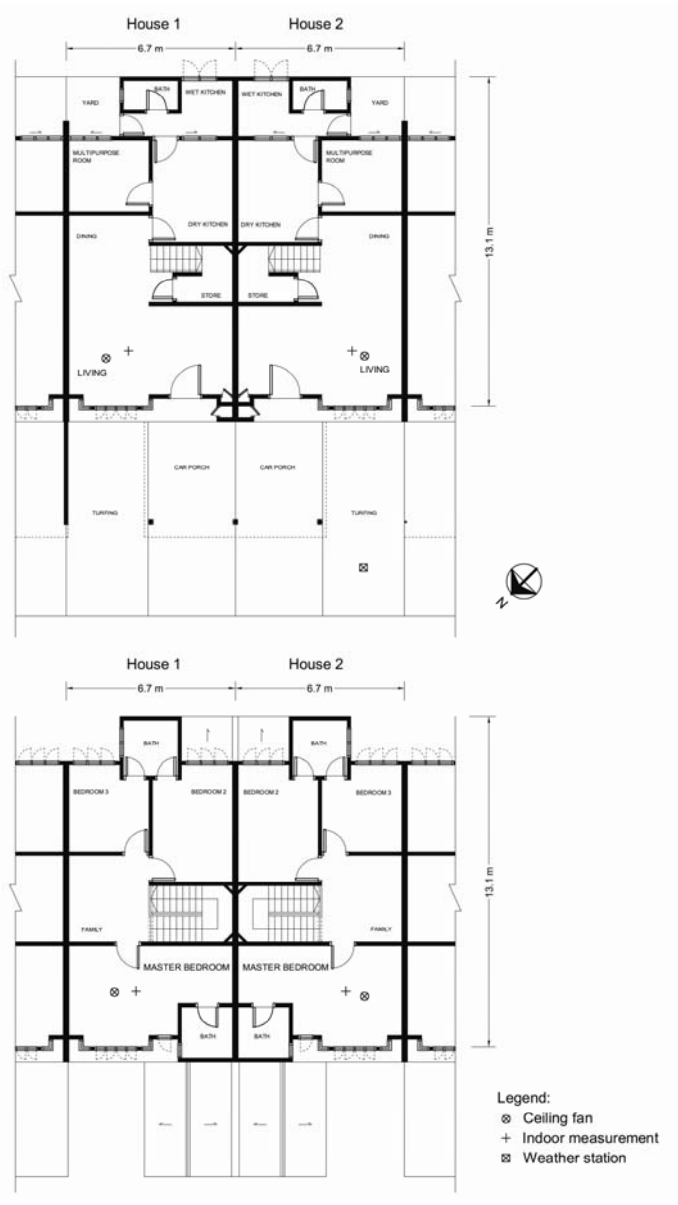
Ground floor plan (*top*) and first floor plan (*bottom*) of the case study houses.
